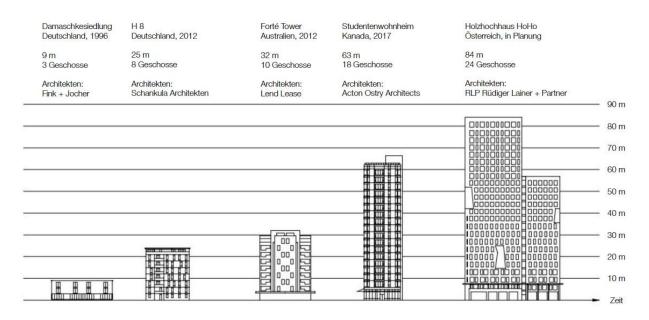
Development of multi-story wooden constructions (Atlas Mehrgeschossiger Holzbau 2017)
